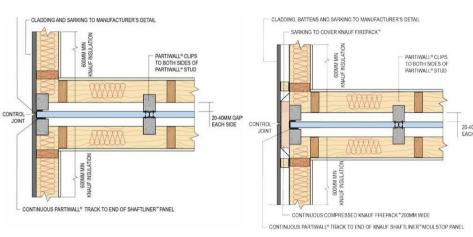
Brick Veneer Wall Junction 1 - Plan View Figure 34: Brick Veneer Wall Junction 2 - Plan view
